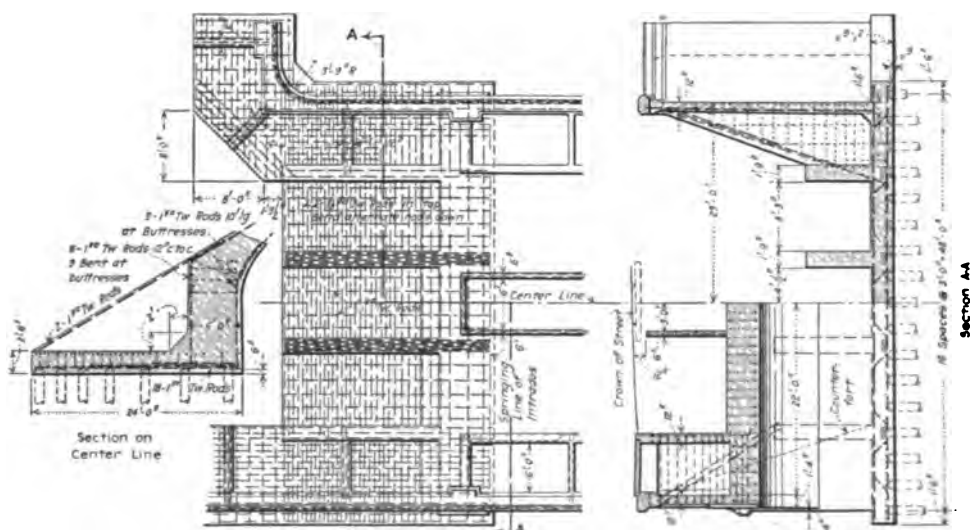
B.—Details of west abutment, Olentangy River bridge on King Avenue, Columbus, Ohio.
